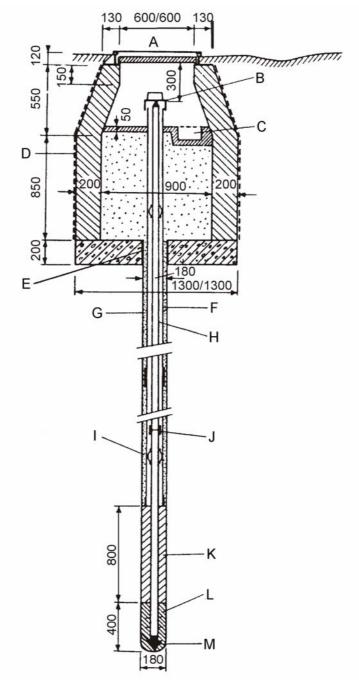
Settlement gauge or contractometer (dimensions in mm)
